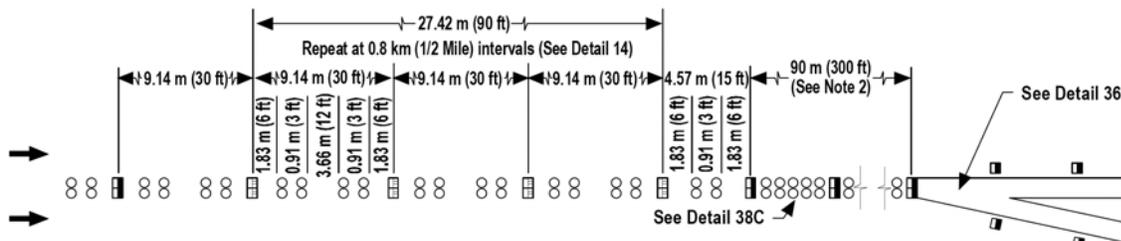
Lane Drop Markings at Exit Ramps
